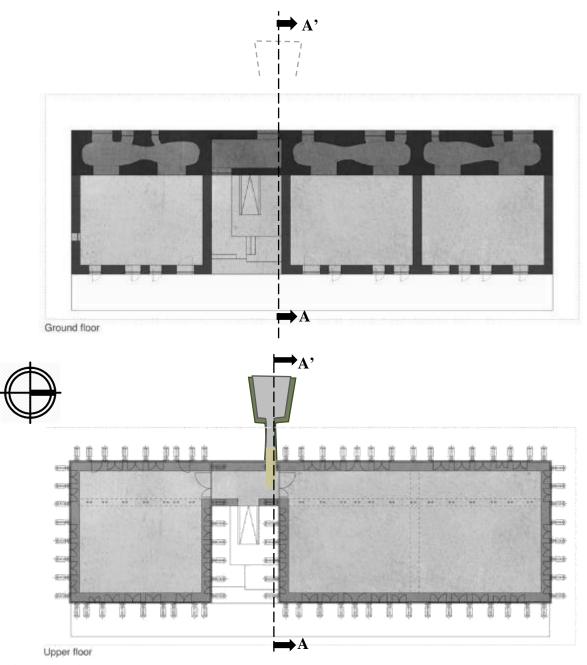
Two floor Plans of The METI Handmade School, Bangladesh (Tanvi Naik, 2017).
